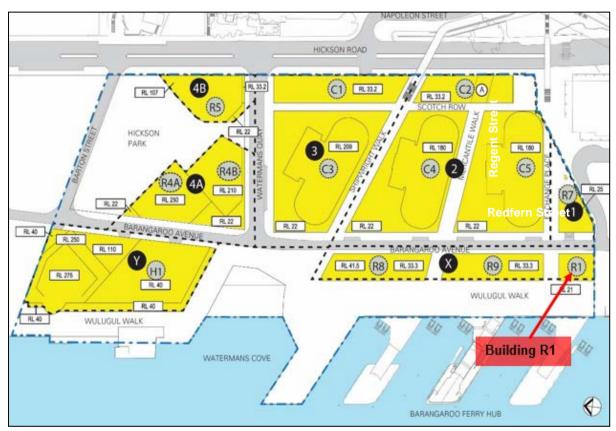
The site is indicated in red (Source: Applicant's MP 06\_0162 MOD 8)
